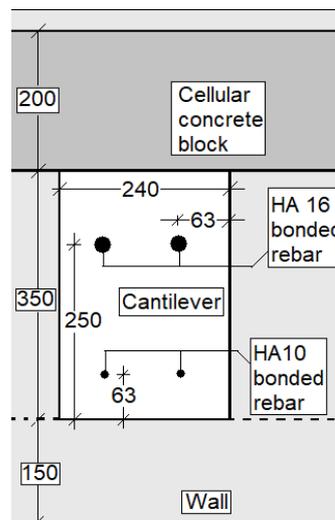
Cantilever beam cross-sectional details (All dimensions in mm)
